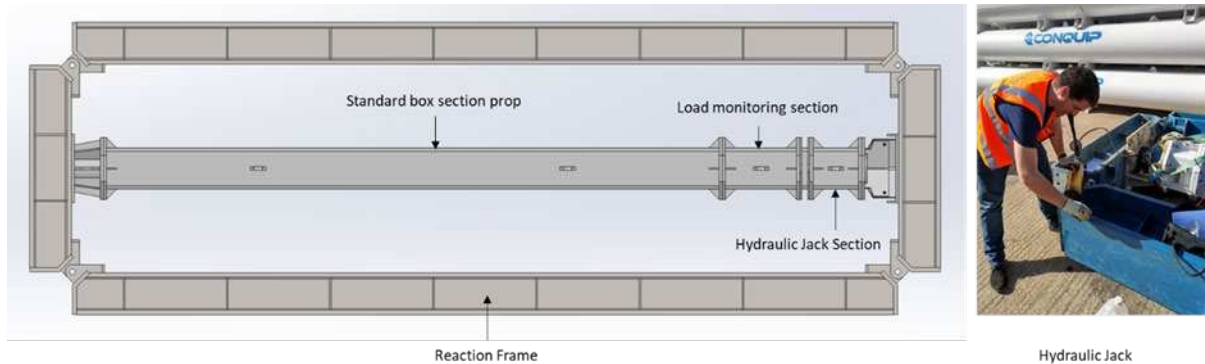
Test arrangement showing reaction frame and hydraulic jack.
